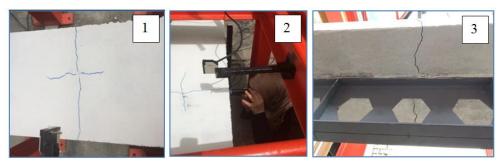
Crack Patterns of Composite castellated beam 33.8%
